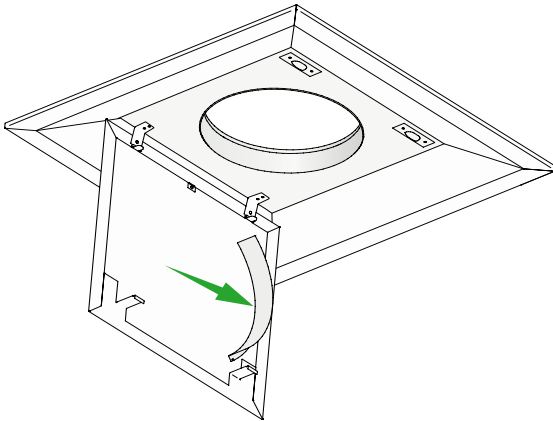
Alternative 1, blanking plate installed on the diffuser face.
